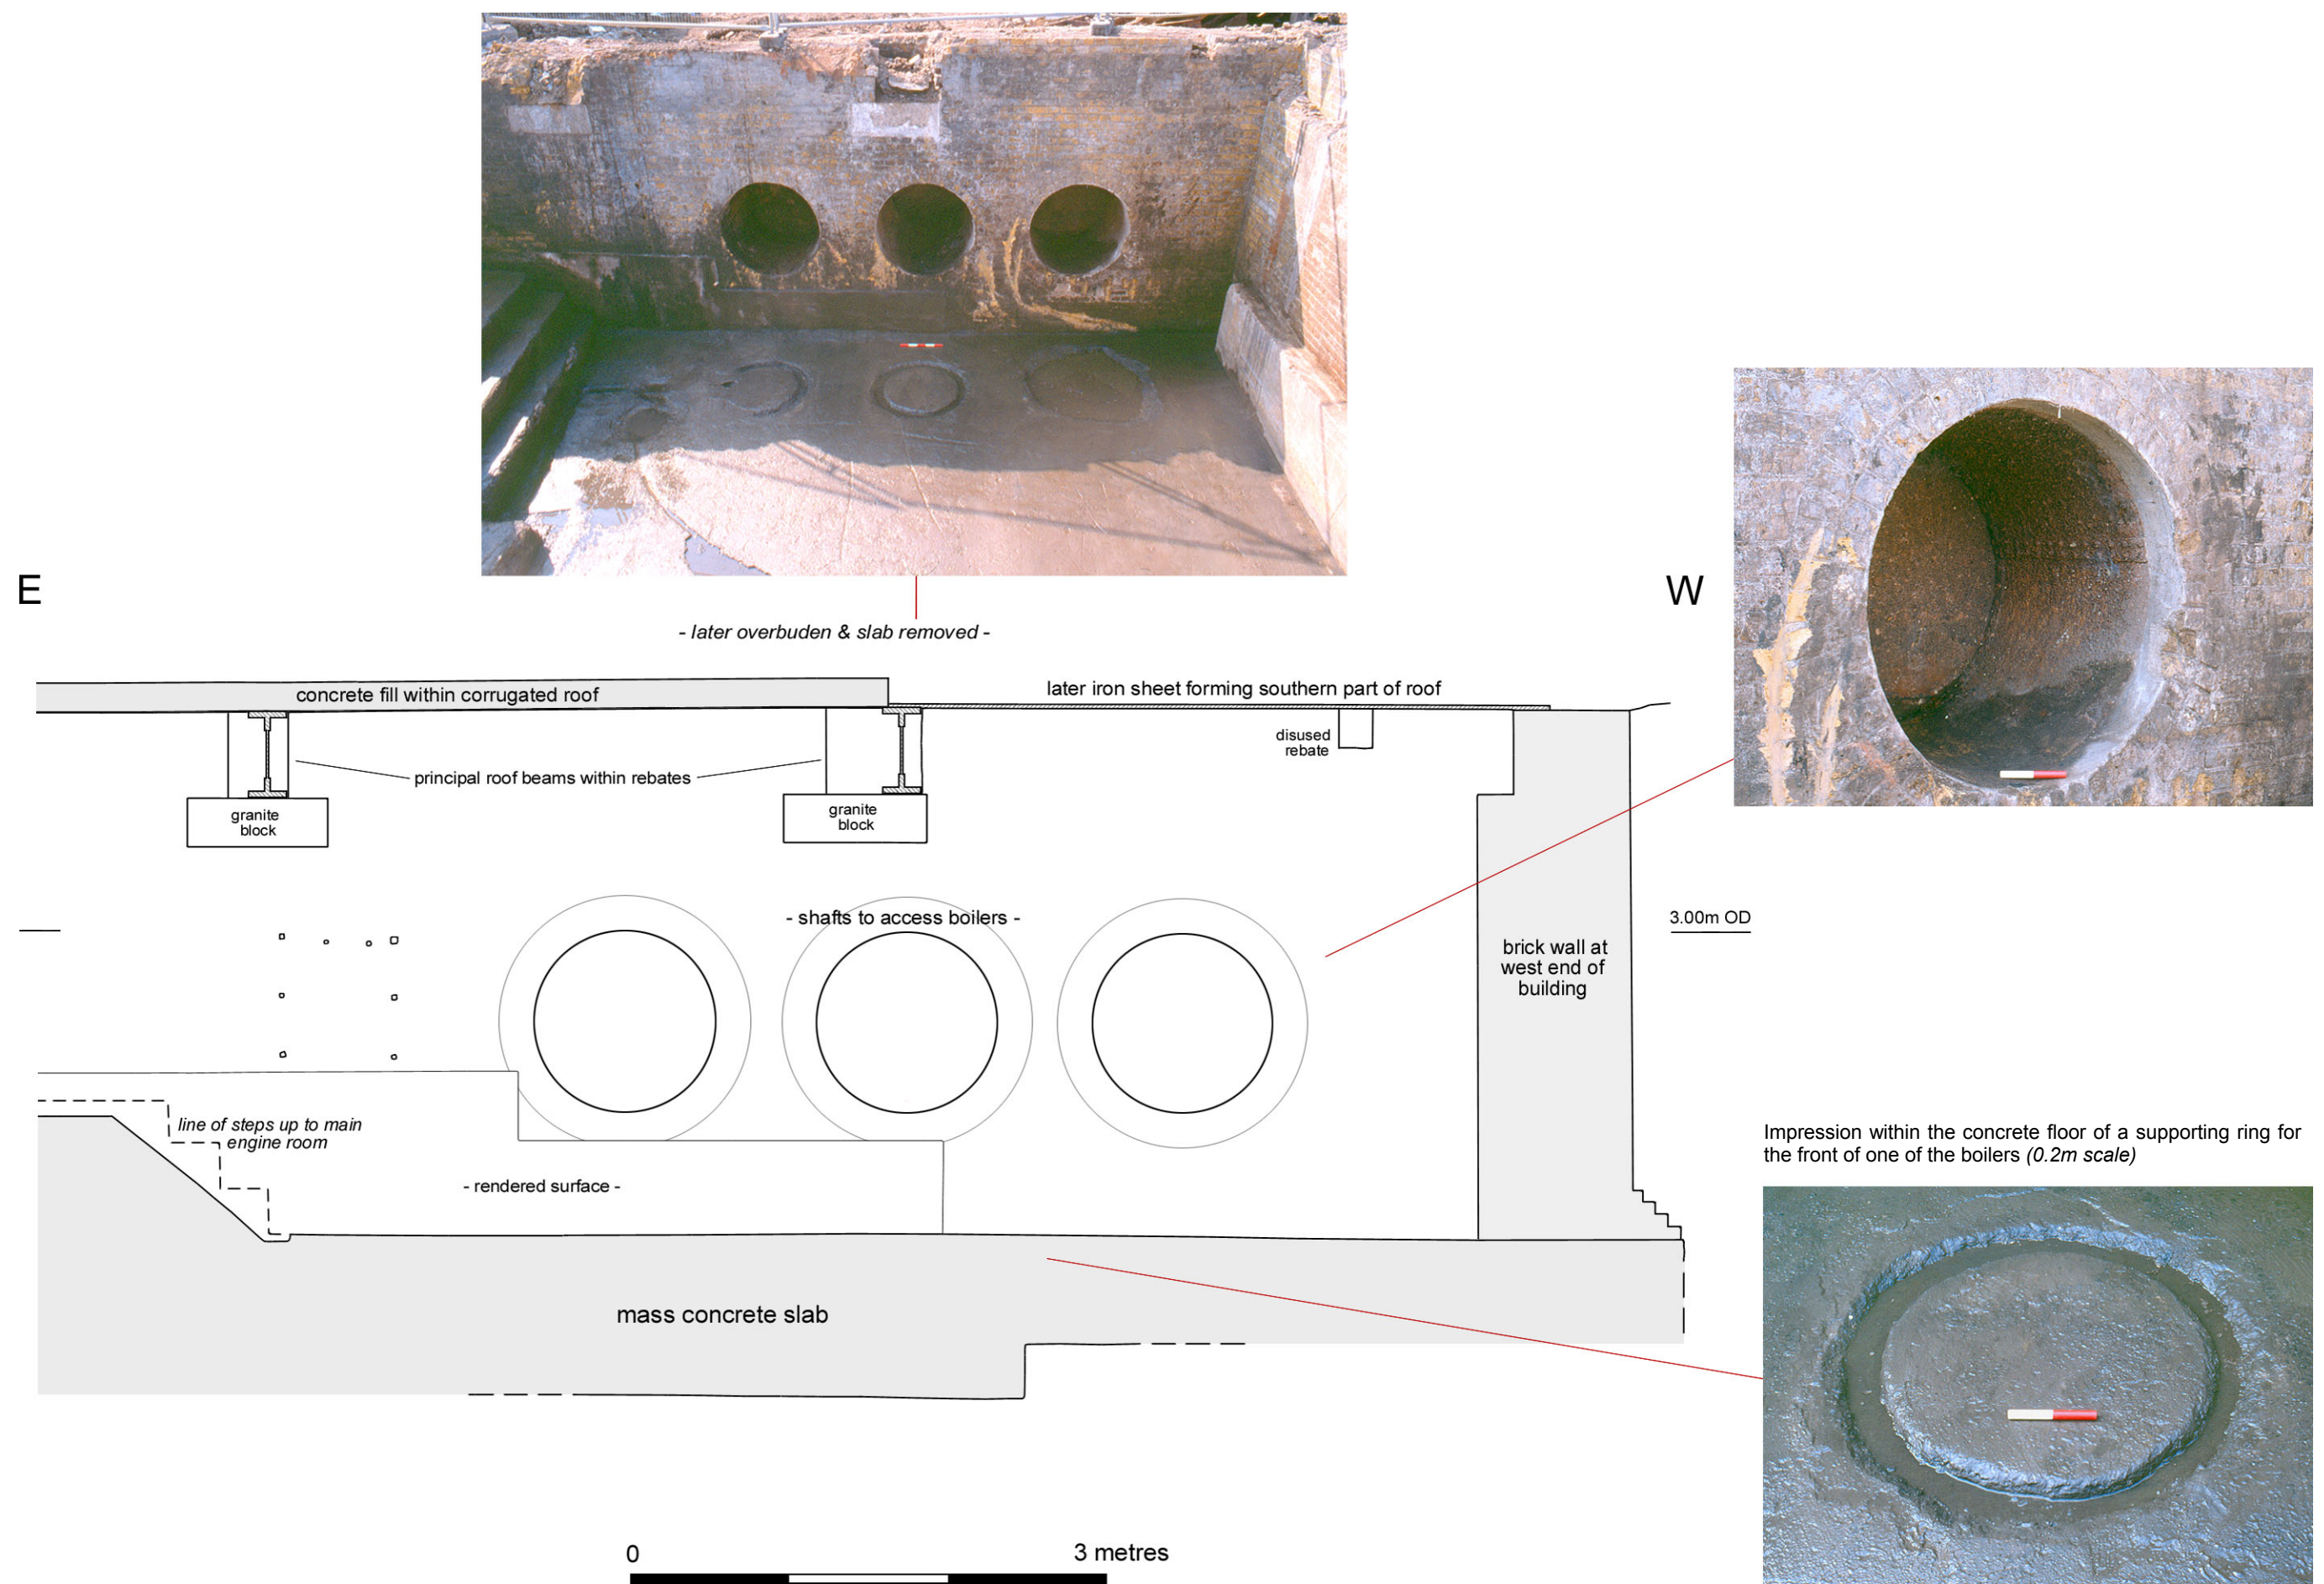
Elevation of the southern wall of the boiler area. Note particularly the shafts to give access to smoke boxes and tubes at the front of the three boilers (*see Figs 9 & 11 for location*)
